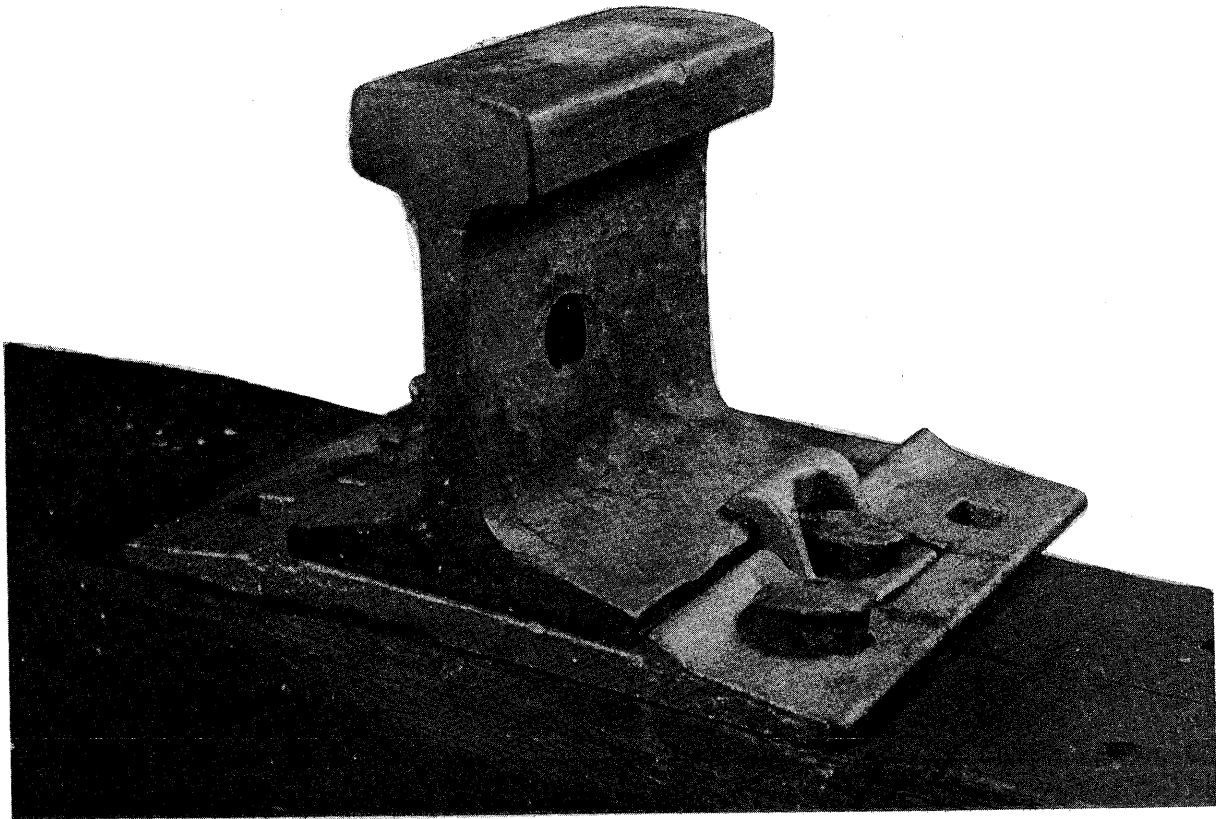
Sections 44 and 45, Dayton Rubber Co.'s Tie Plate and Pad.
